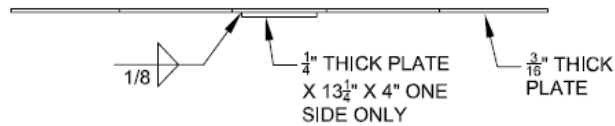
Specimen Design Drawing – Fuse for Test B1 – Left Frame
